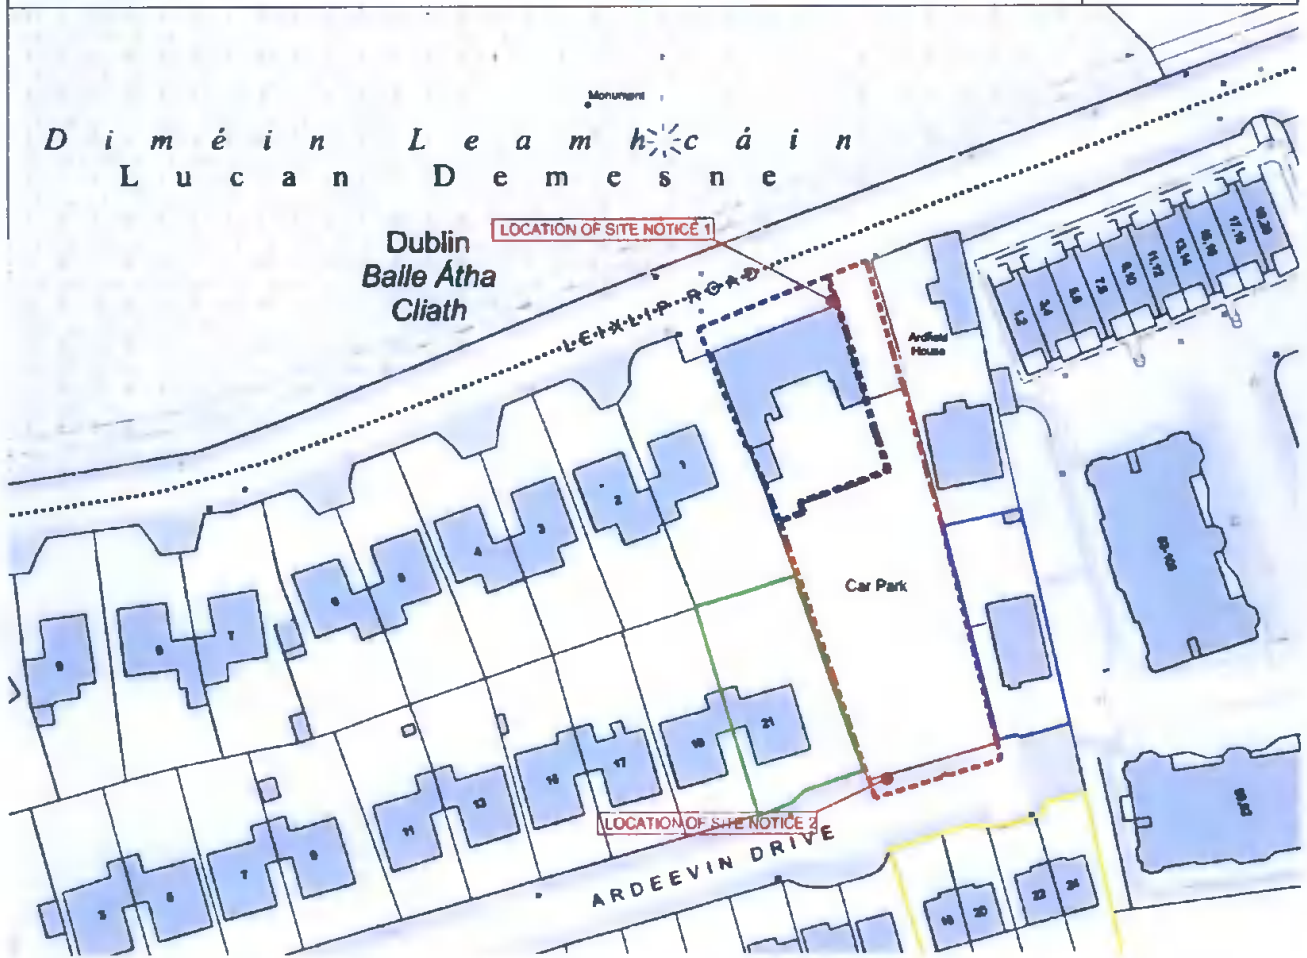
Affected houses 18-24 Ardeevin Drive outlined in green, blue and yellow
